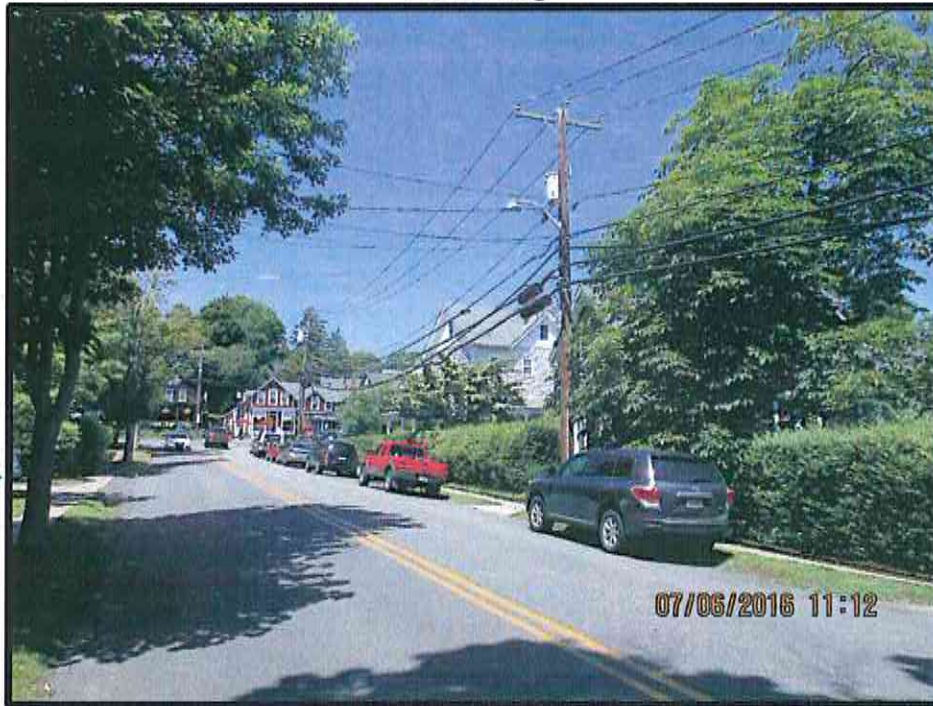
View looking west on Chase Avenue towards proposed pole for riser installation.
